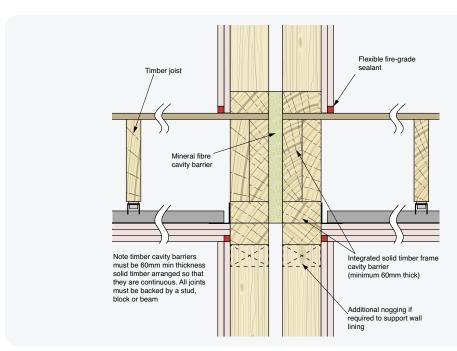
FRL 120/120/120 Fire-protected timber frame wall/floor junction with integral cavity barriers – beams parallel to wall
